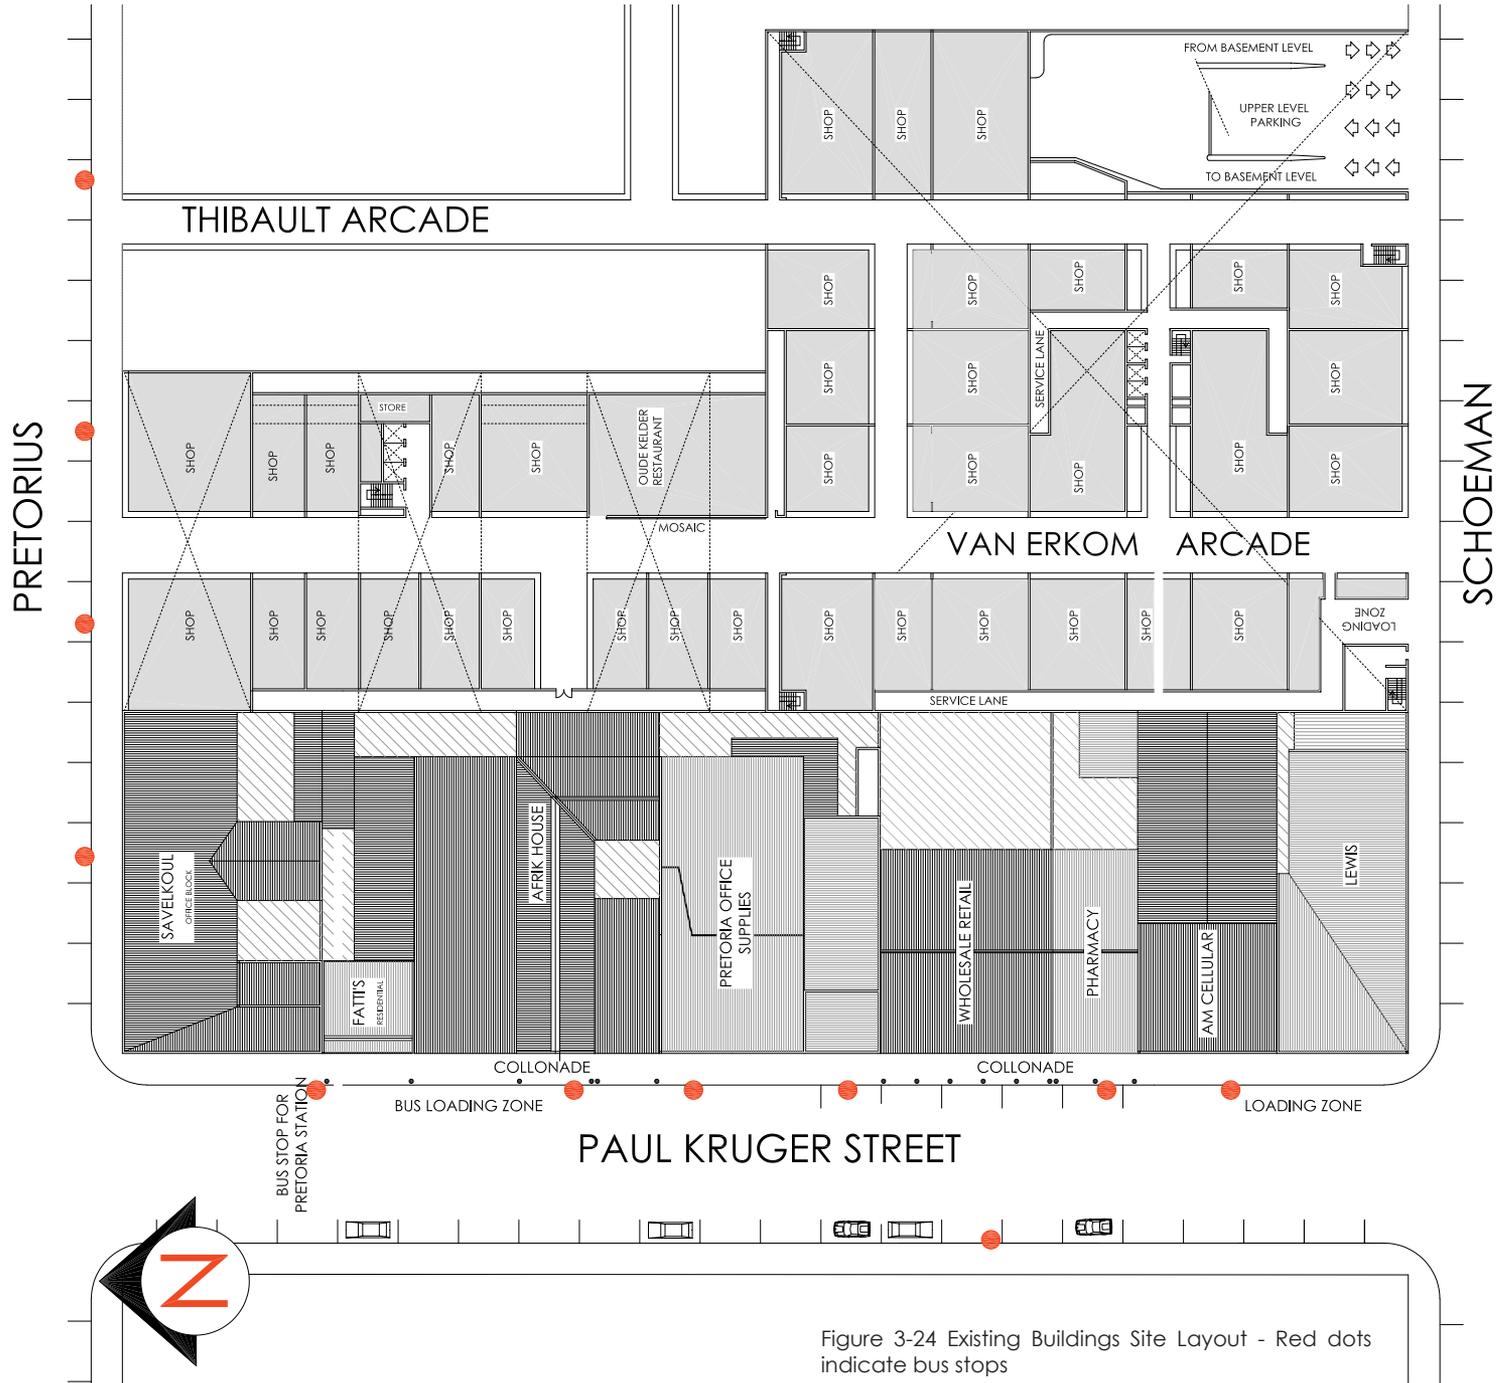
Existing Buildings Site Layout - Red dots indicate bus stops
